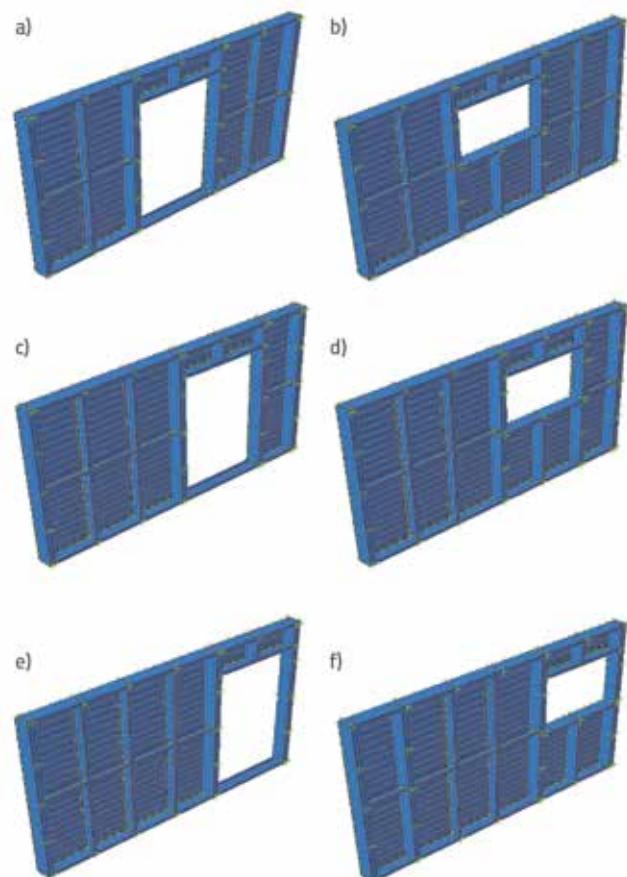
Positions of openings: a) Door opening (position-1); b) Window opening (position-1); c) Door opening (position-2); d) Window opening (position-2); e) Door opening (position-3); f) Window opening (position-3)
